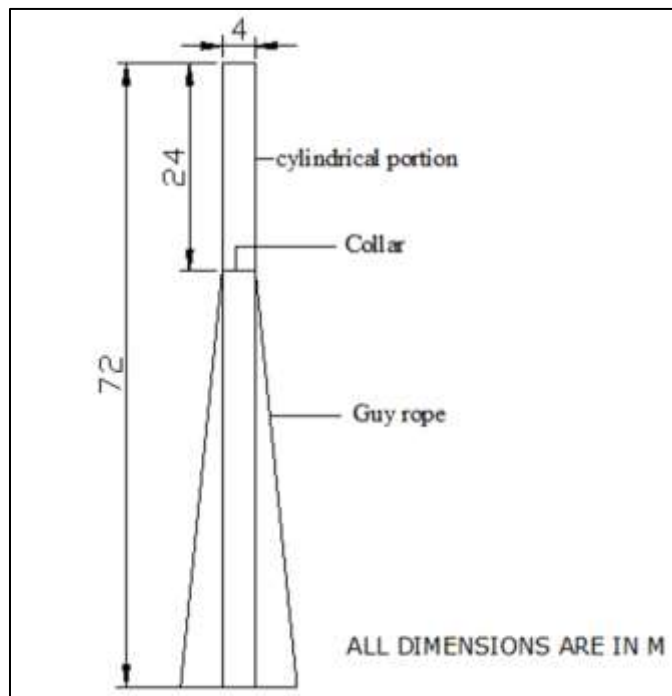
Auto CADD Drawing of Guyed Steel Chimney
